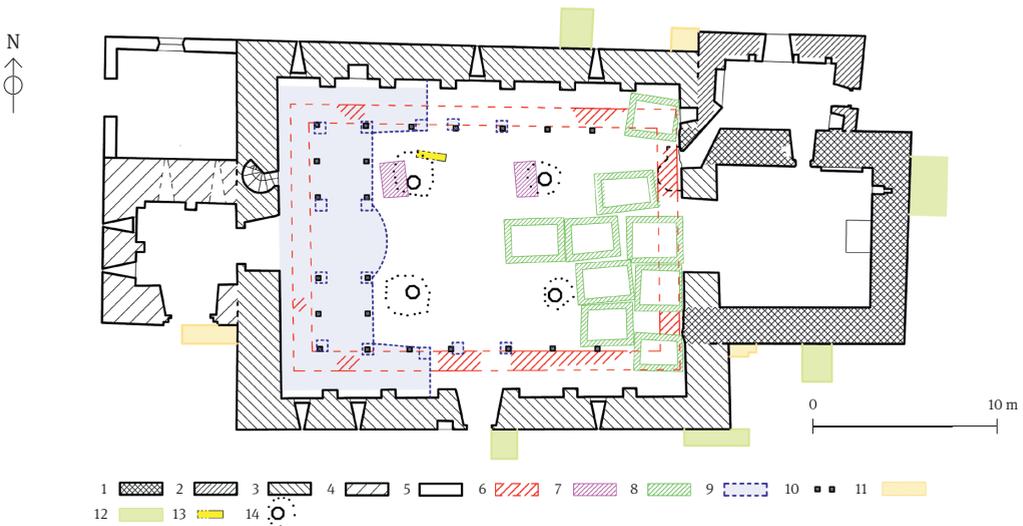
Plan of Haljala church. 1 – building stage I: chancel, 2 – building stage II: sacristy, 3 – building stage III: nave, 4 – building stage IV: western tower, 5 – early modern additions, 6 – remains and reconstruction of the walls of the earlier nave, 7 – foundations of side altars, 8 – burial chambers, 9 – discovered post foundations and reconstruction of the extent of the earlier organ gallery, 10 – posts of the existing gallery, 11 – test pits of 1959, 12 – test pits of 1987, 13 – burial with timber coffin, 14 – pillars with the extent of their foundations.
